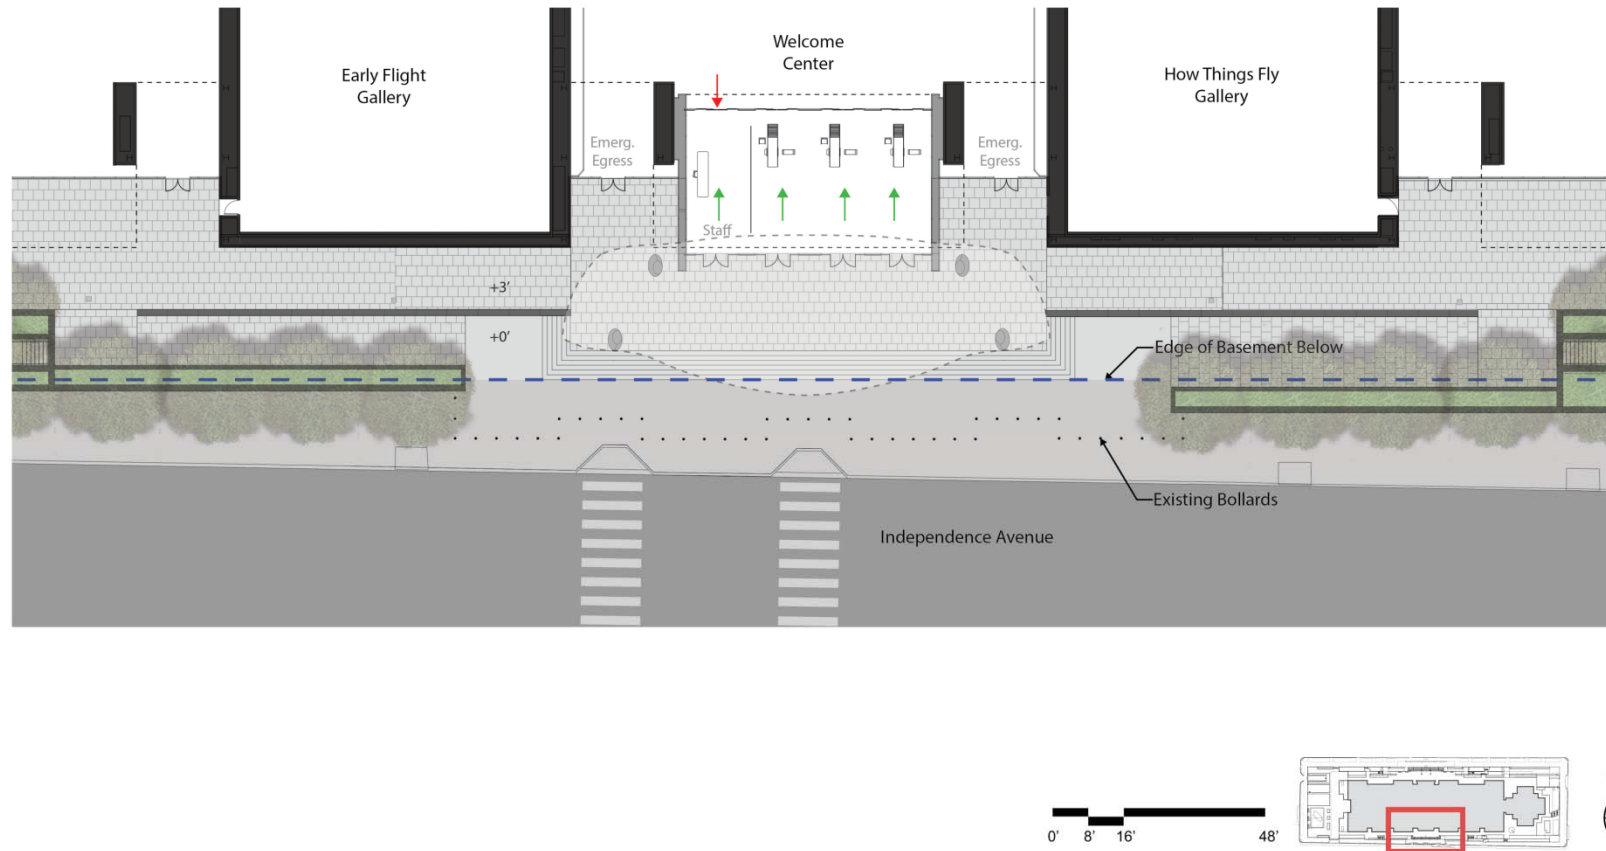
14: South Vestibule Design 'A' Floor Plan. (Source: QEA.)
